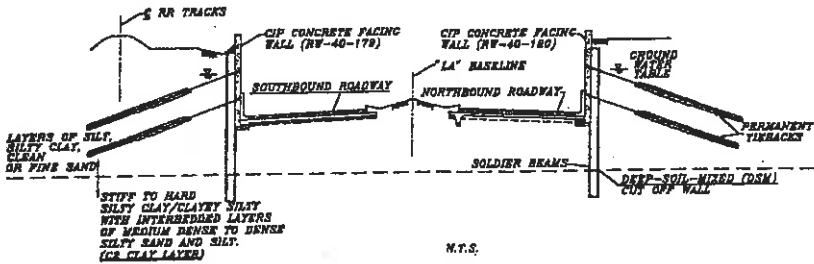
Lakeway Parkway Section @ Sta. 168 "LA"
